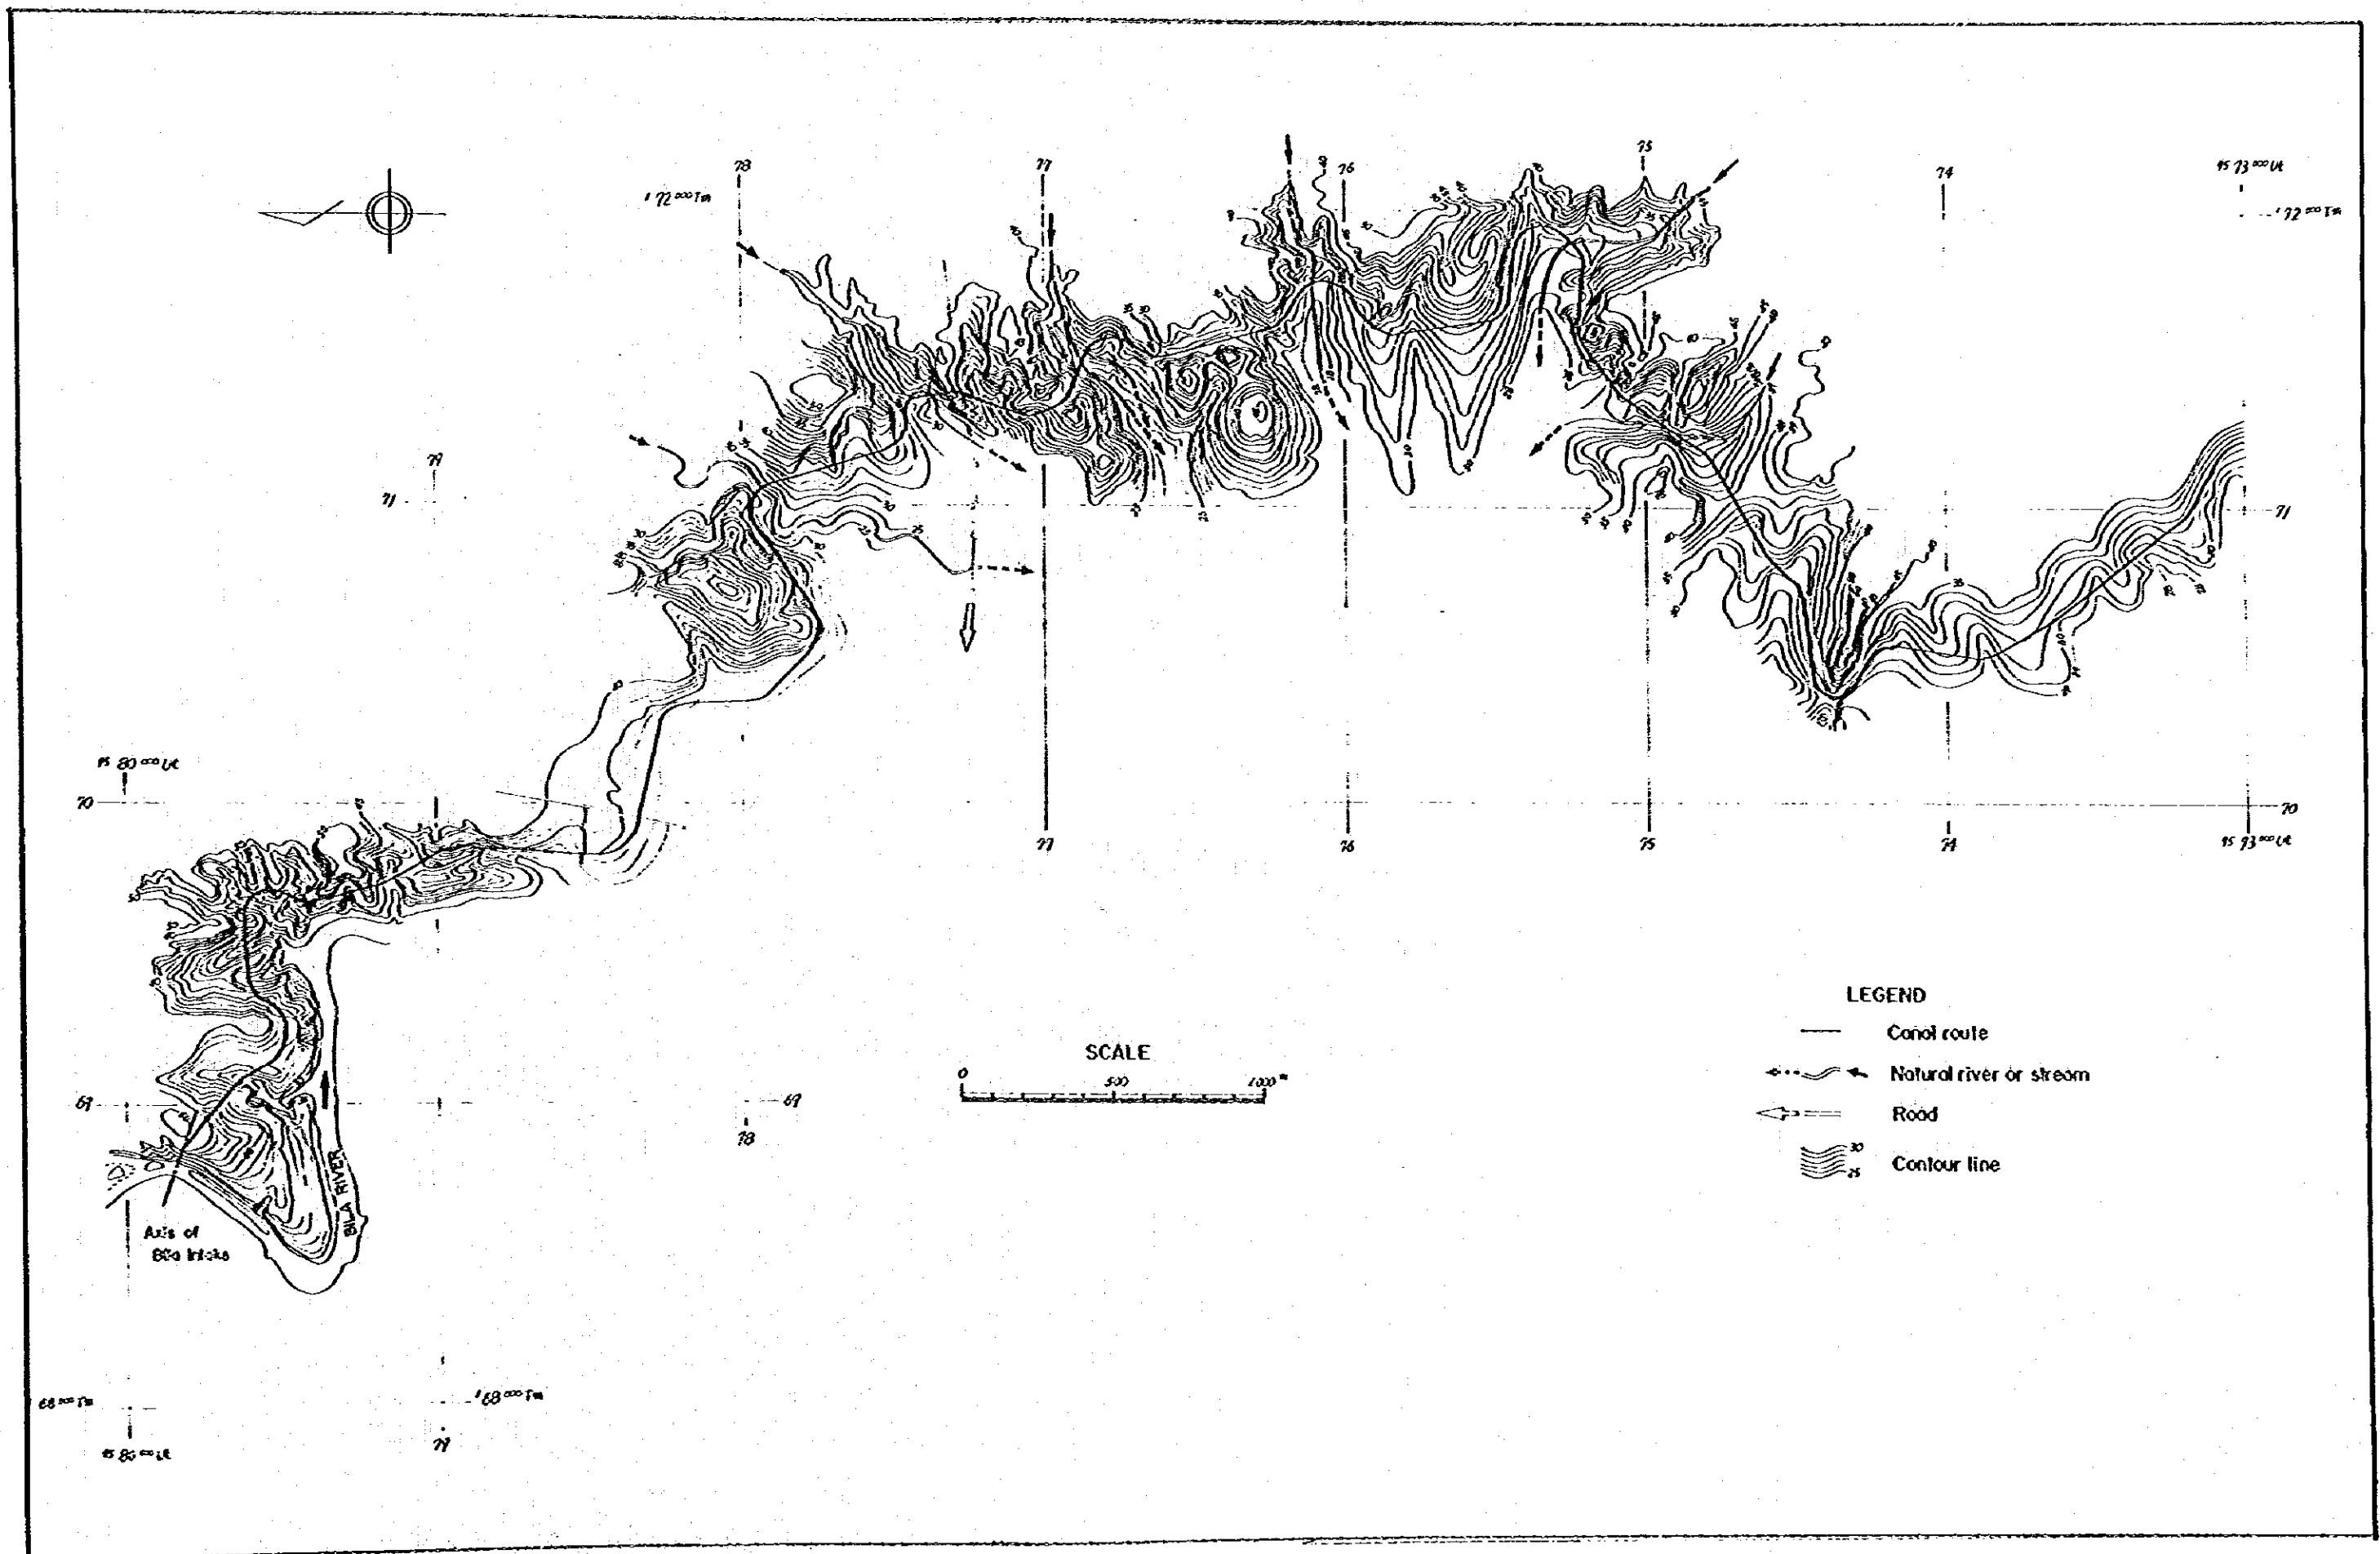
TOPOGRAPHIC SURVEY AND MAIN IRRIGATION ROUTE OF MASTER PLAN (1/3)
